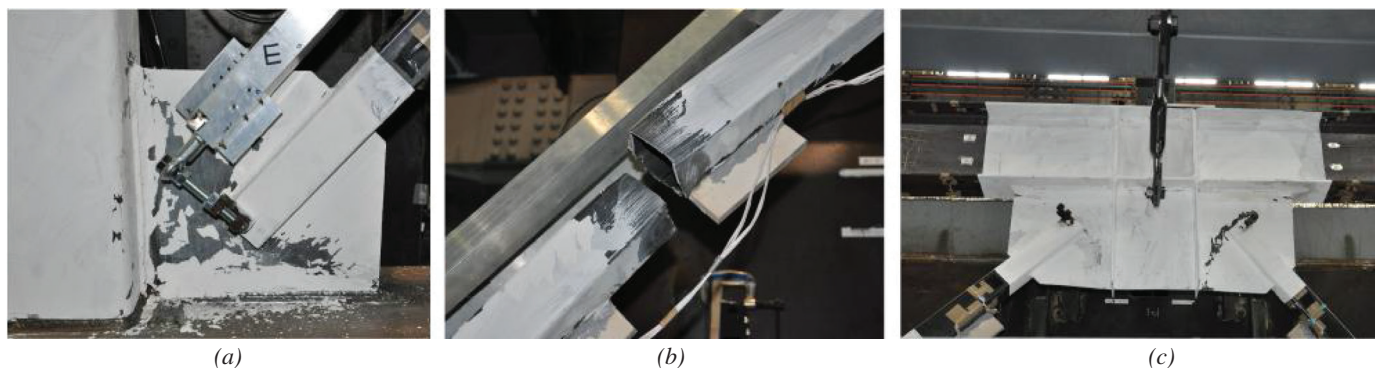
(a) Gusset plate yielding; (b) steel brace fracture; (c) mid-beam gusset plate yielding.
